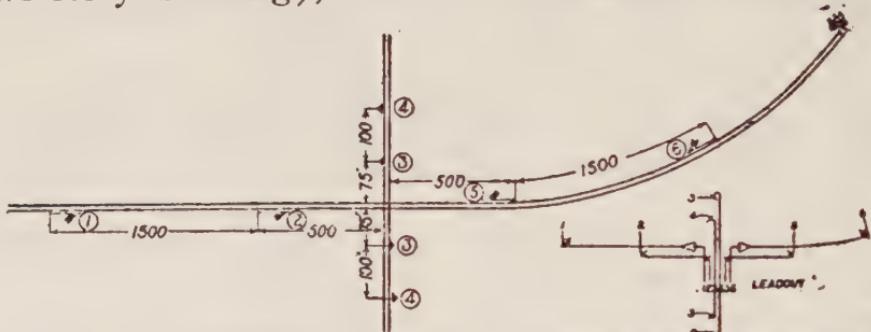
shows a track plan locking and dog sheet for a single track drawbridge taken from actual practice, which will serve to illustrate what has preceded on this head.
